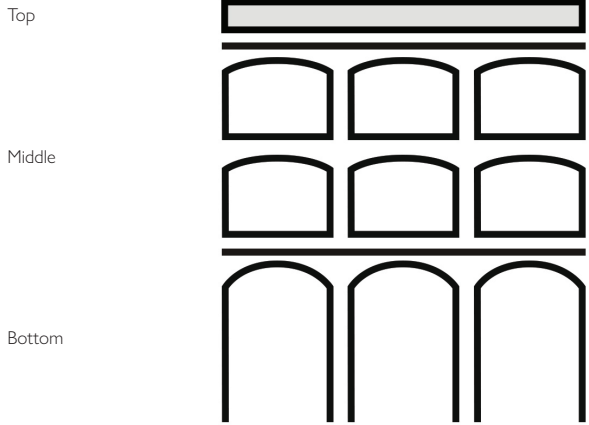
Building façade detail on Electric Avenue
